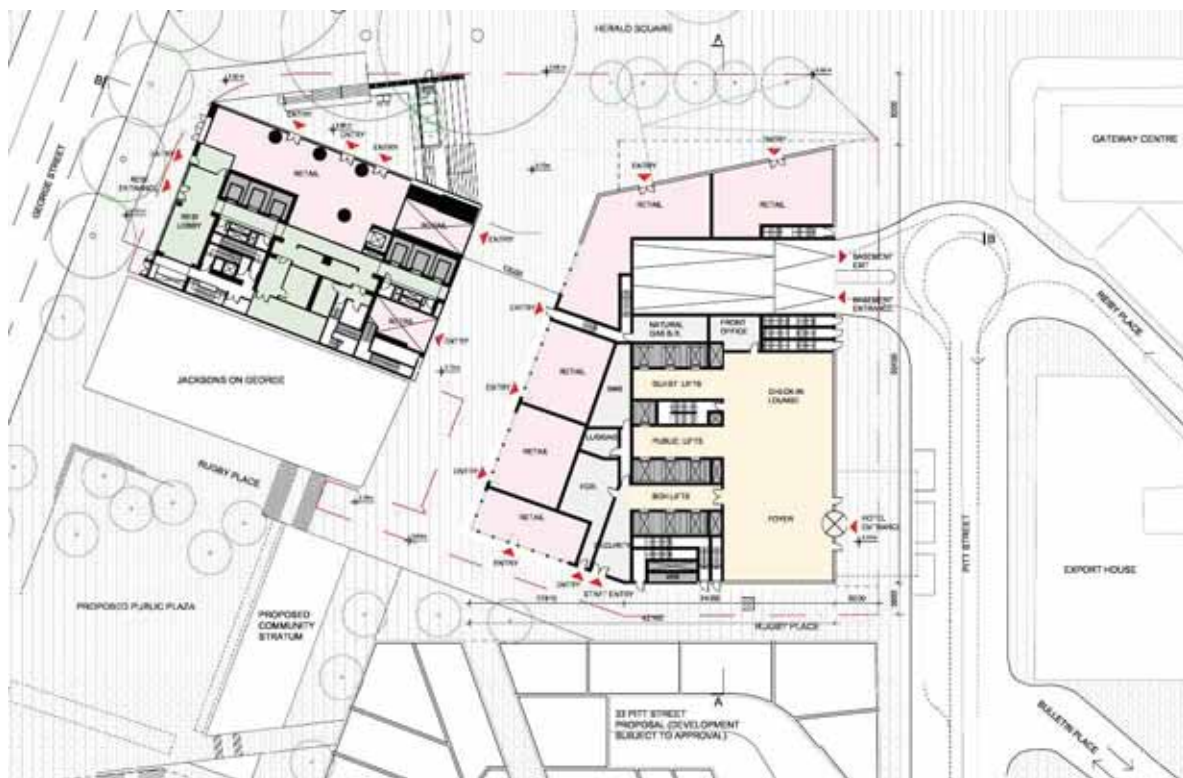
Indicative site access and set-down/pick-up (Source: Applicant's RtS)
